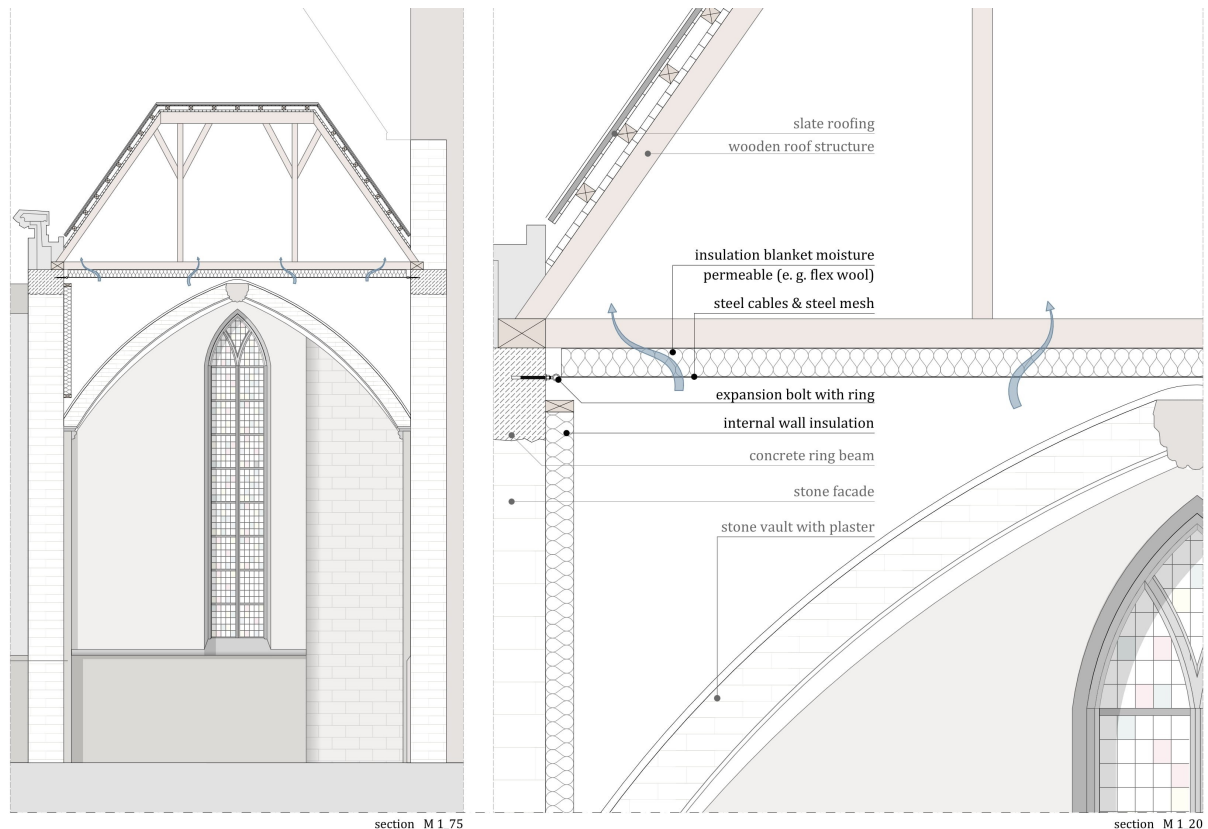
Detail stone roof insulation - exemplary for the Side chapels
